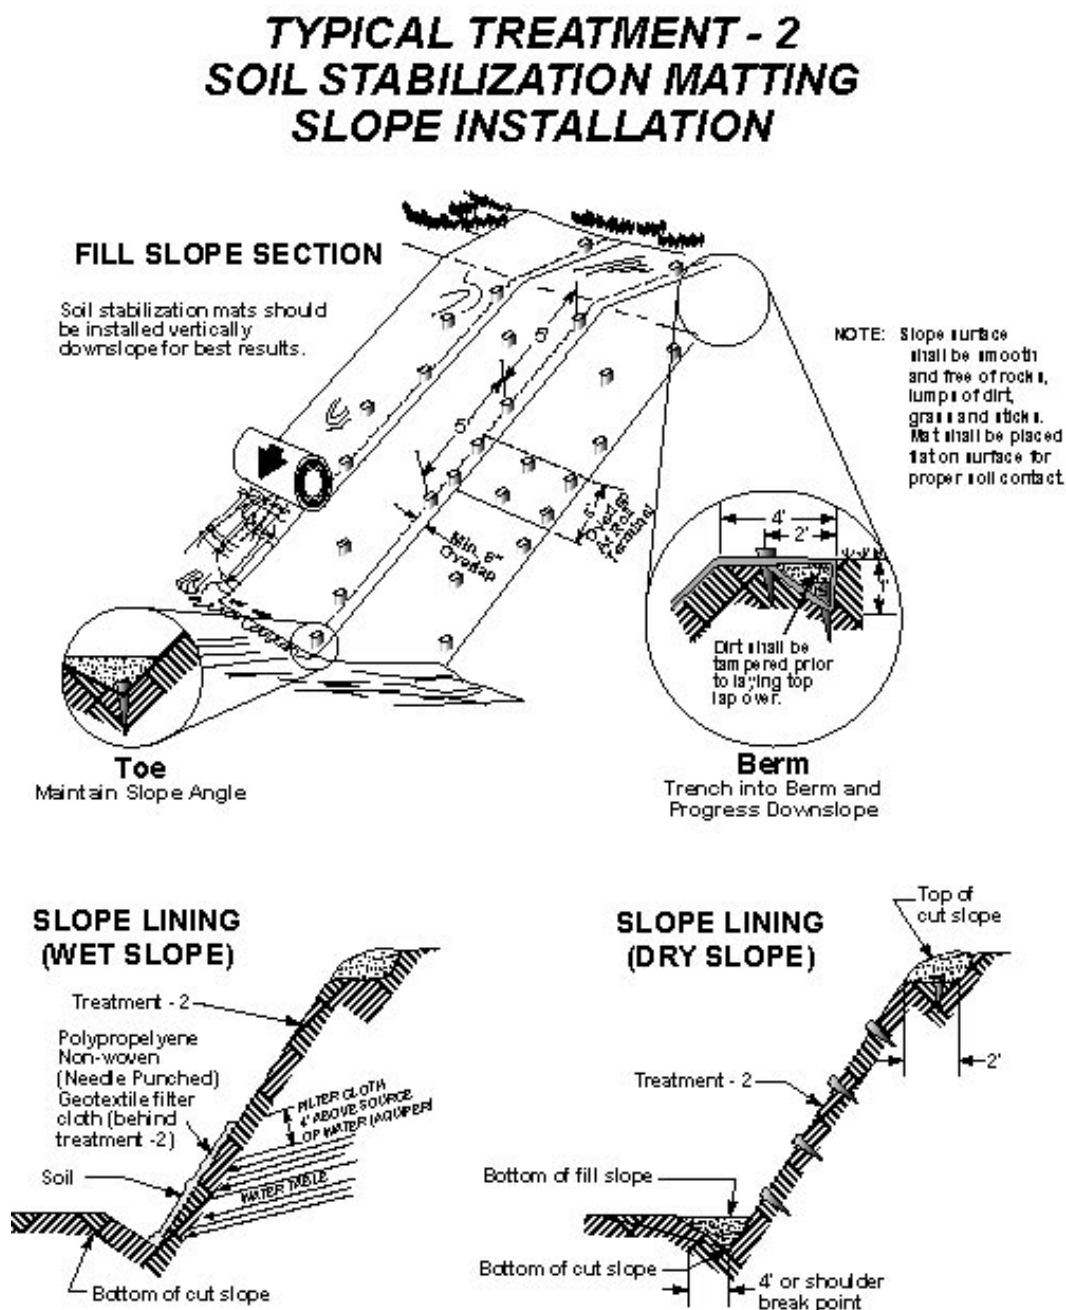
Typical Treatment – 2 Soil Stabilization Matting Installation
